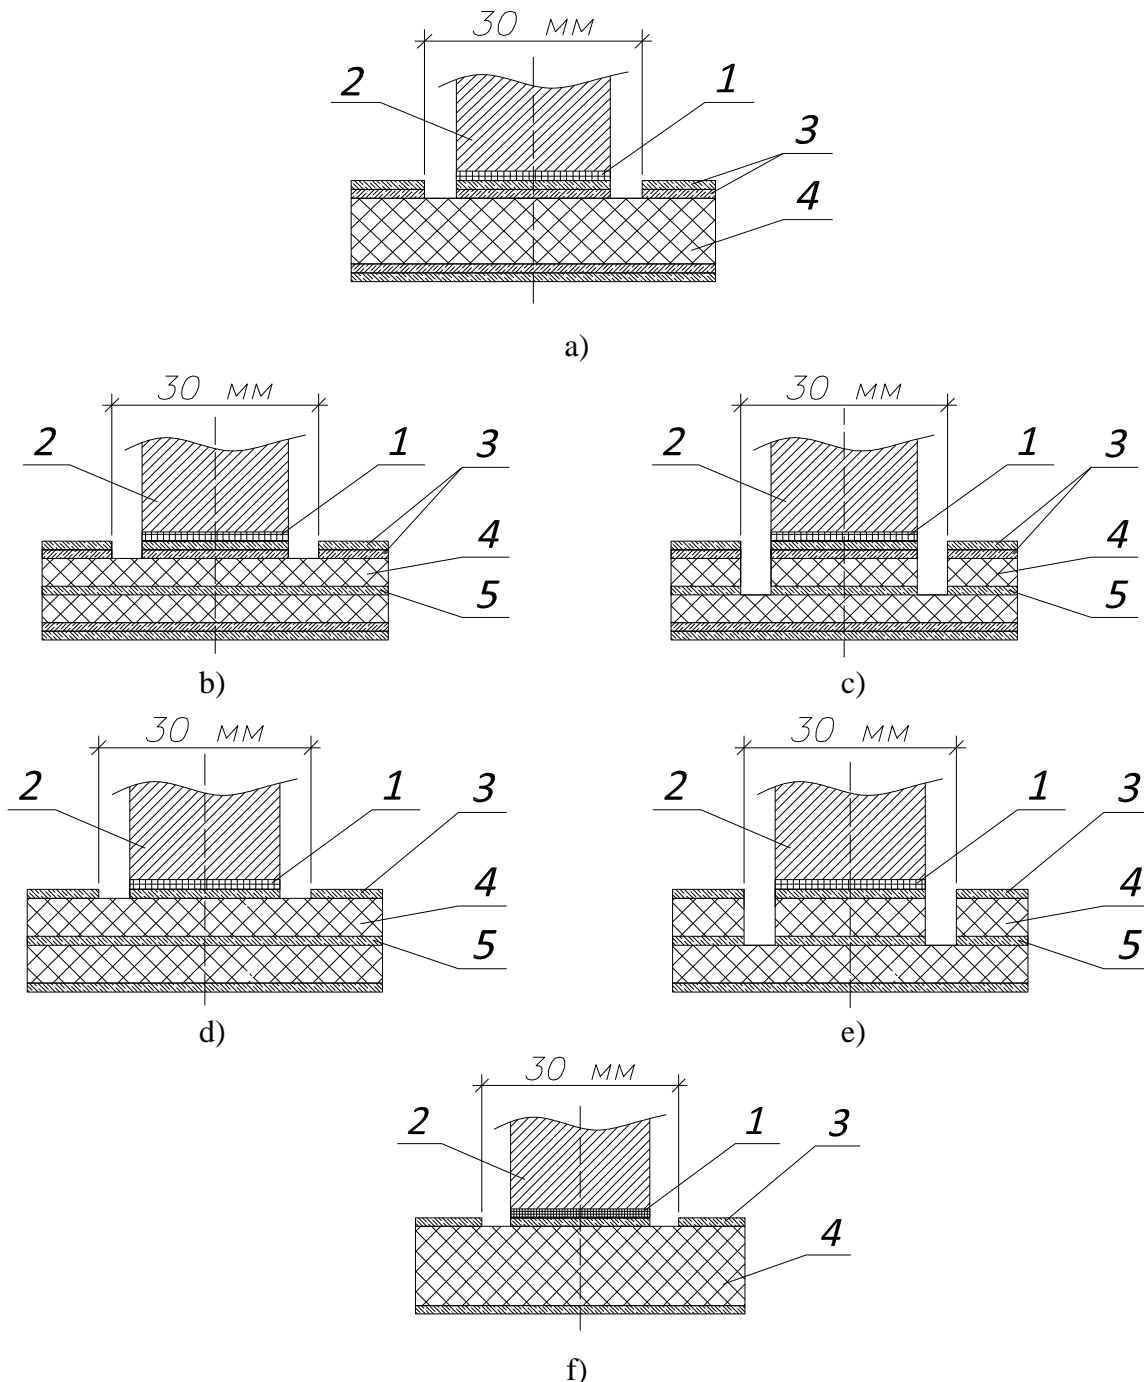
Cylinder installation diagrams during the test: a) assembly diagram No 1 (outer veneer sheets); b) assembly diagram No 2 (outer veneer sheets); c) assembly diagram No 2 (central veneer sheets); d) assembly diagram No 3 (outer veneer sheets); e) assembly diagram No 3 (central veneer sheets); f) assembly diagram No 4 (outer veneer sheets). 1 - a layer of epoxy glue; 2 - birch cylinder; 3 - outer veneer sheets; 4 - the central veneer sheet.
